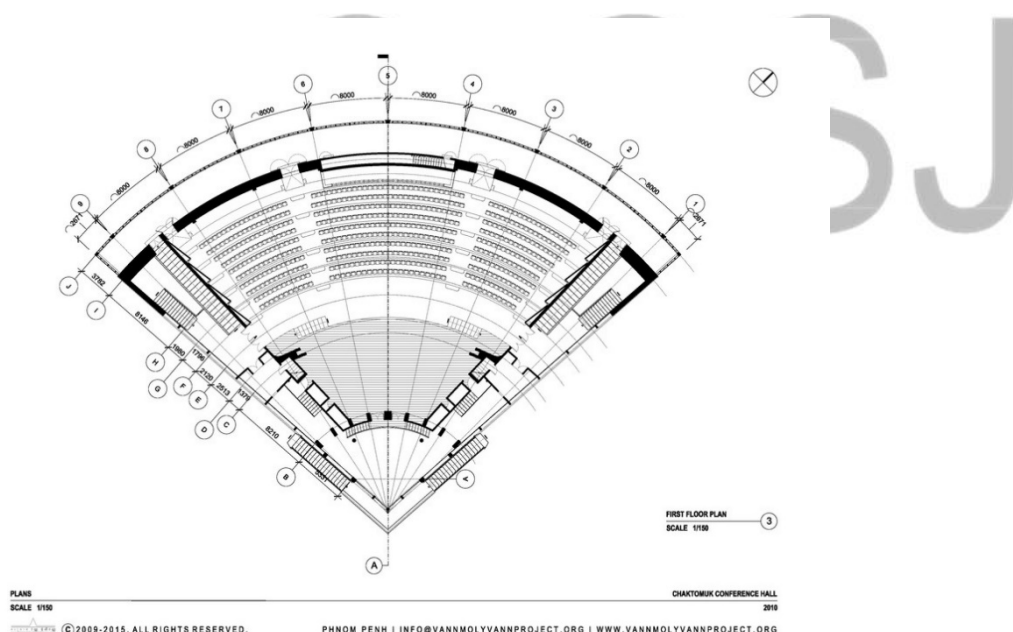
First floor plan of the Chaktomuk Conference Hall. Source: (Odeon, 2020)
